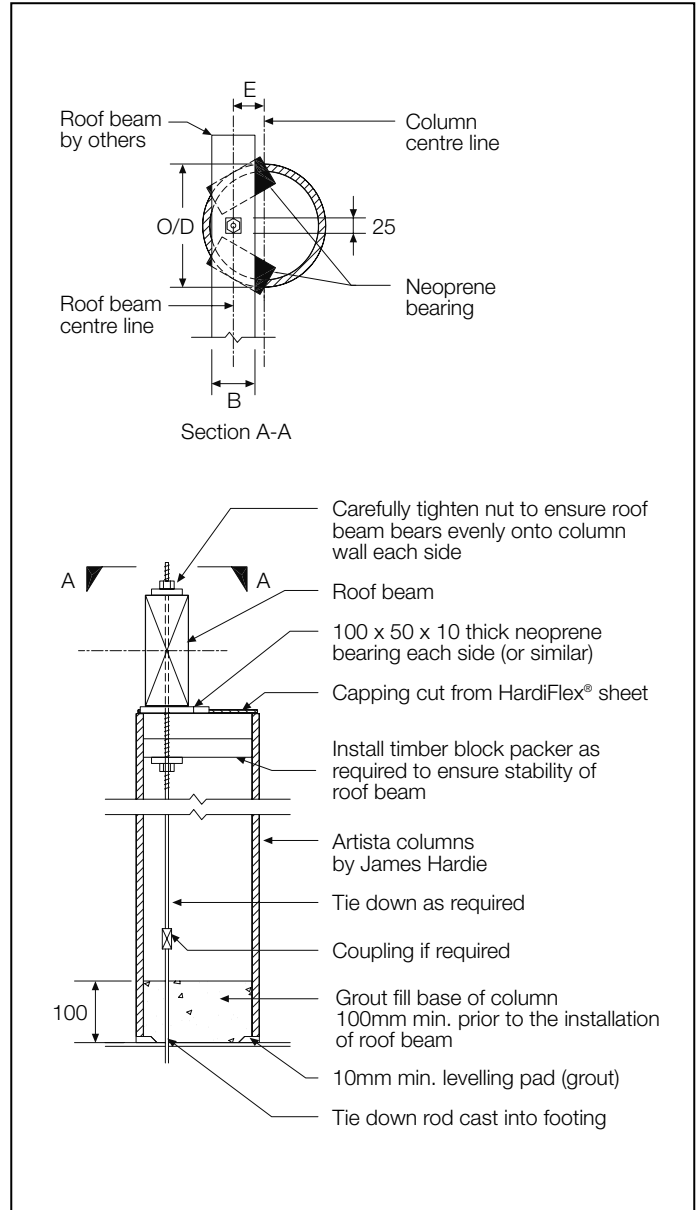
UNFILLED COLUMN LOAD-BEARING DETAIL
